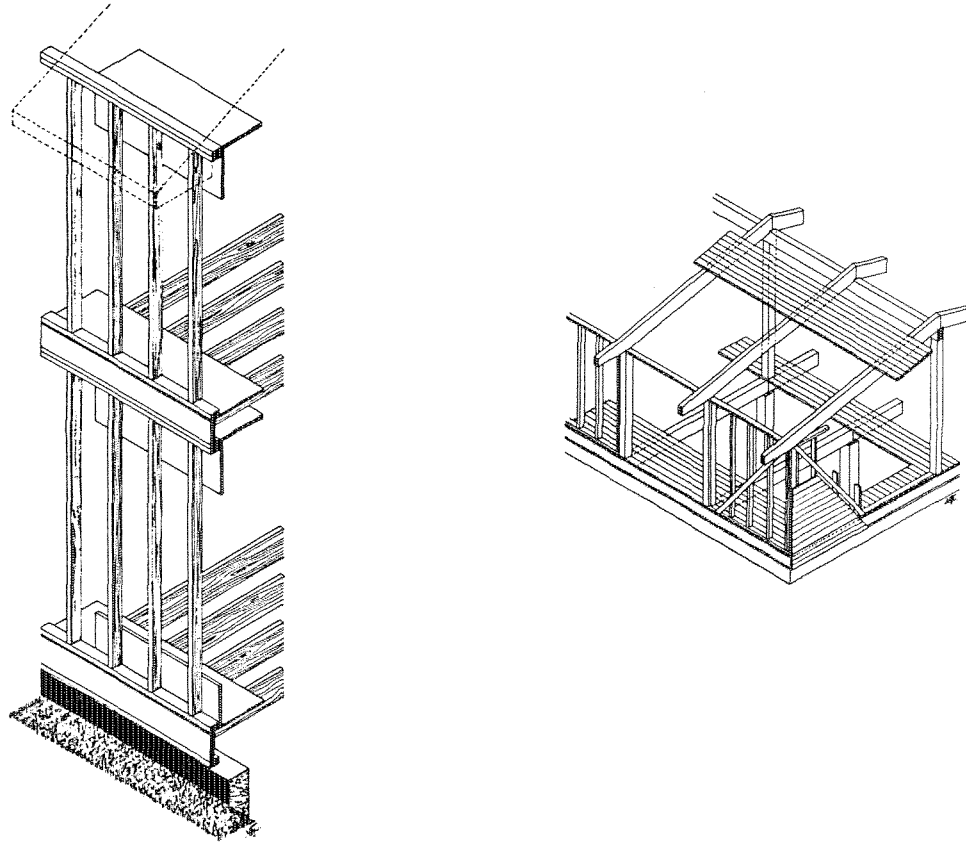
These two drawings show platform framing (left) and post and beam construction (right).
